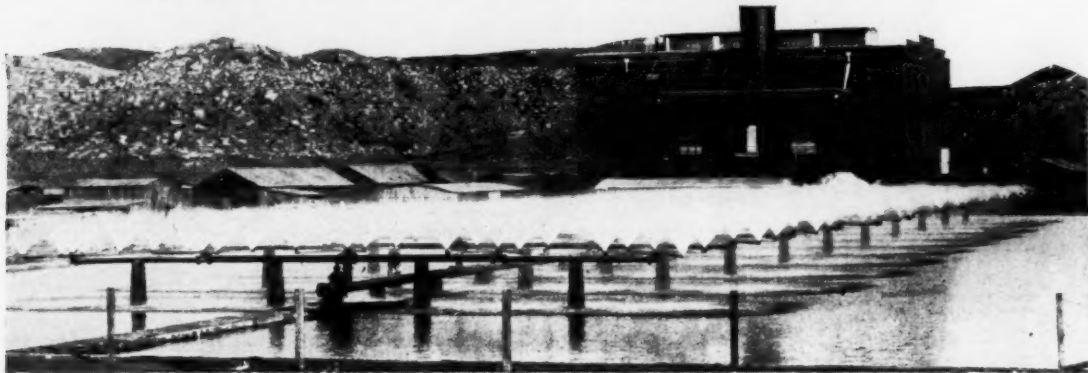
shows a typical cooling pond equipped with spray nozzles as built by Morley Co. The pond is built with concrete sidewalls and bottom to keep water clean and prevent water soaking into the ground.
